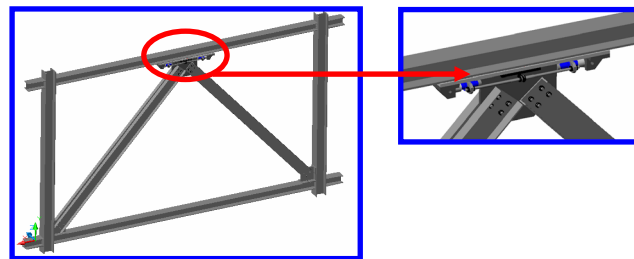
Global and Zoomed Views of a Typical Damped Brace
